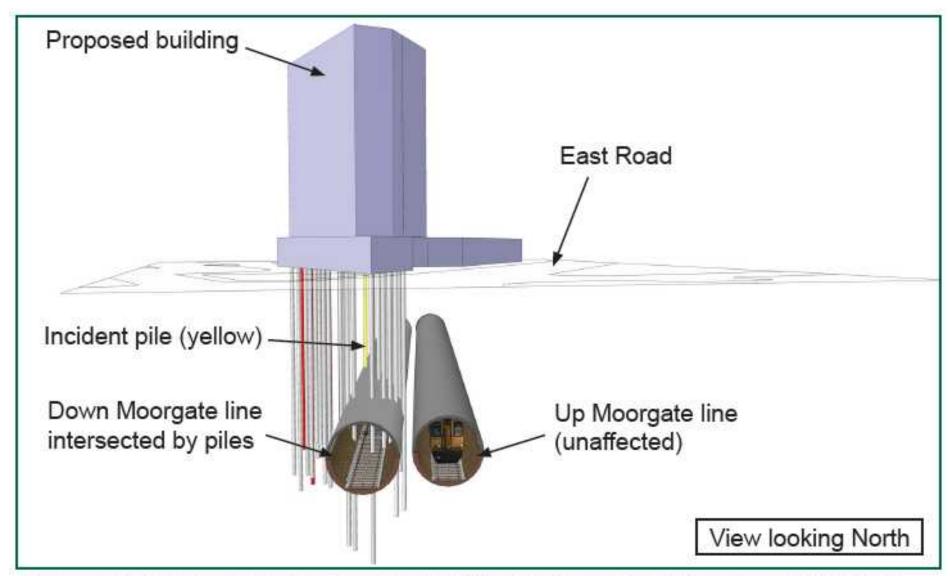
Scale diagram showing proposed foundation layout and extent of interaction with railway tunnel
